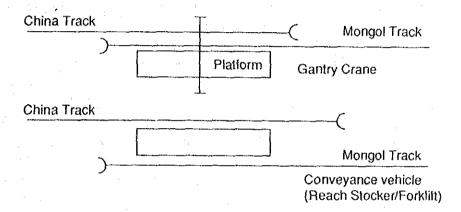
Track Layout by Different Transshipment Equipment
